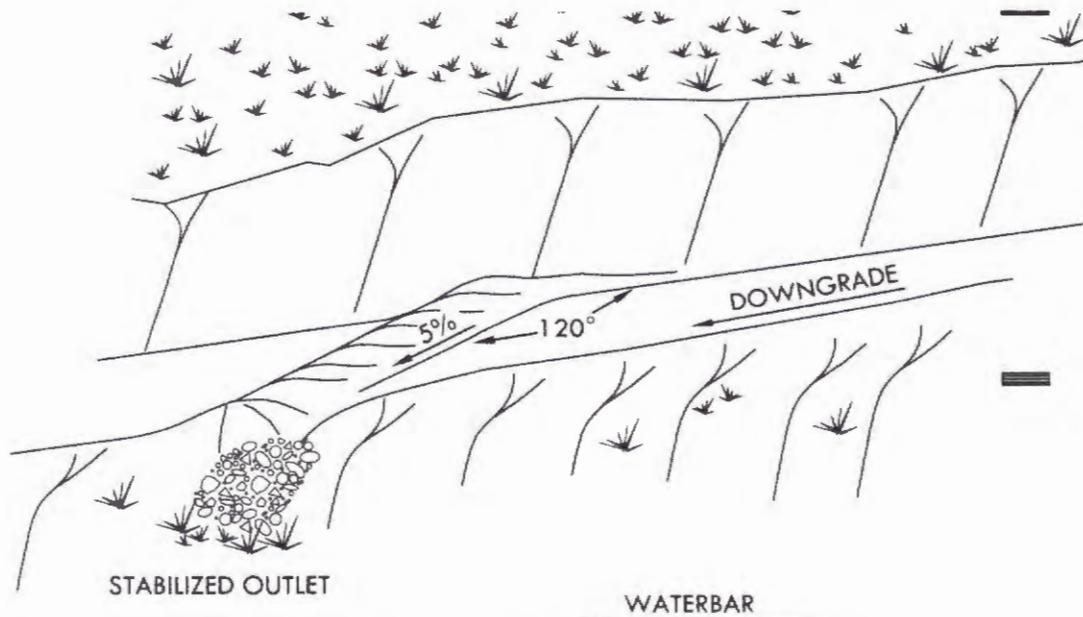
B: COUNTY'S TRAIL RUN-OFF DESIGN DETAILS
